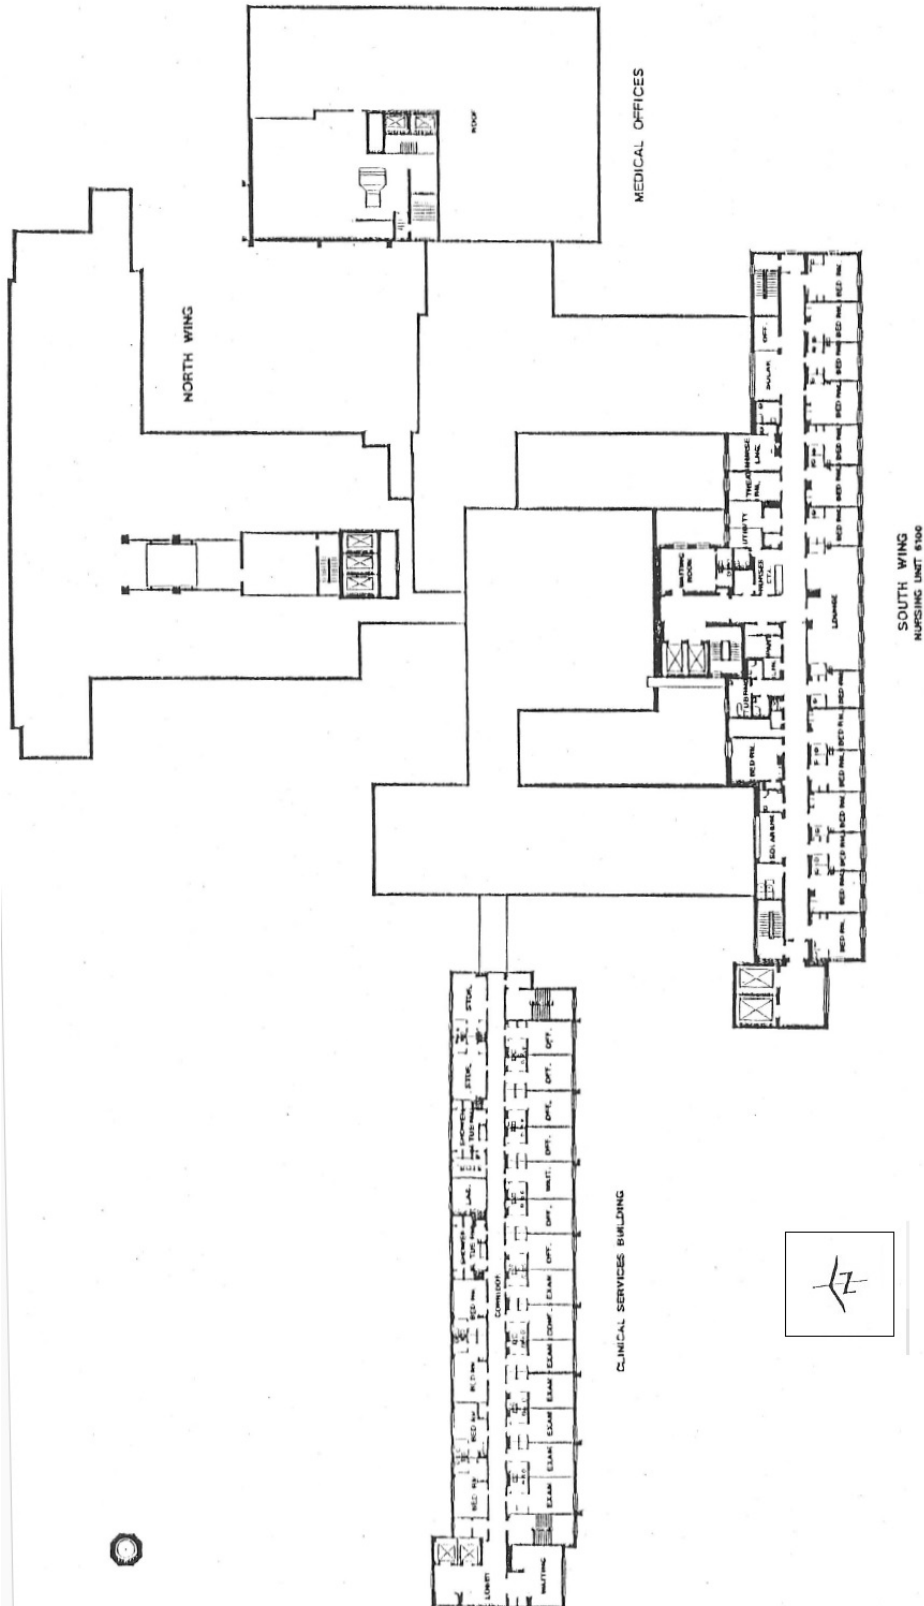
6th floor plan (source: c. 1991 as-built found on site)
